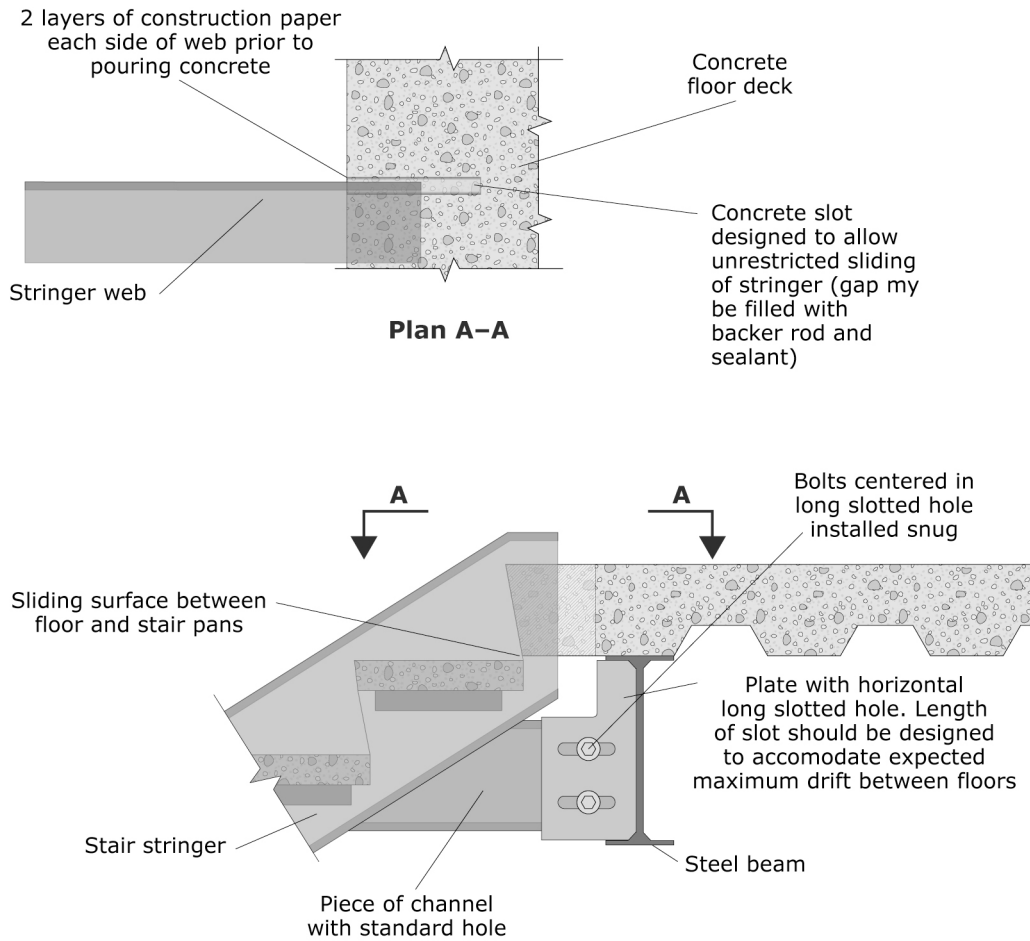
Example slip connection for steel stair stringer (ER).
